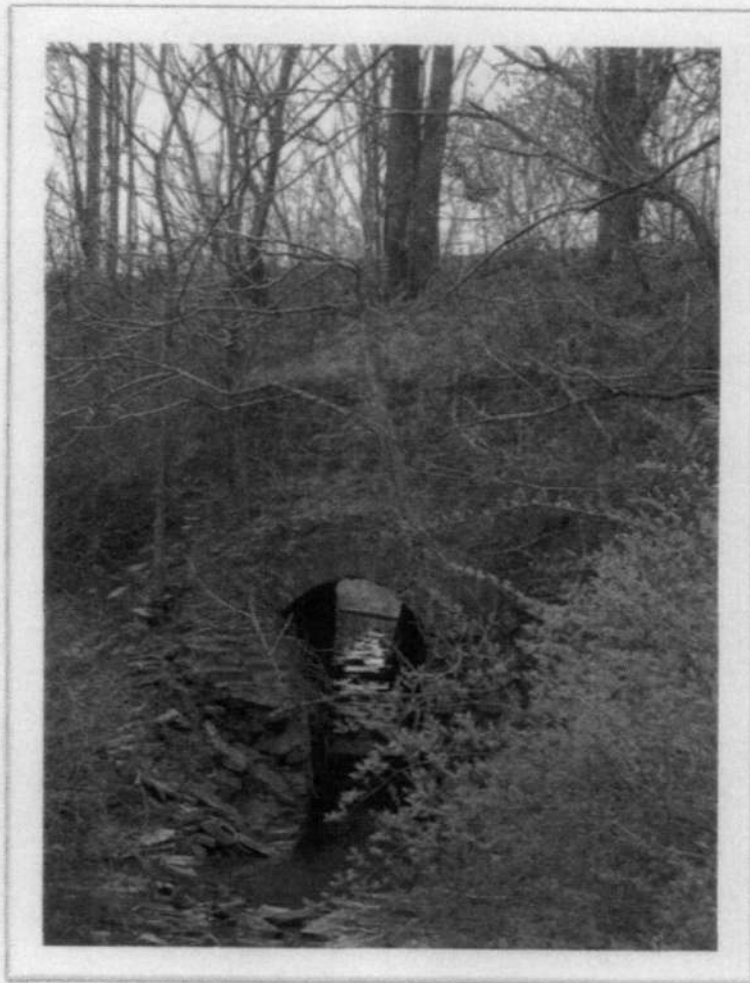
Vertical View of West Elevation of Culvert 67.18
